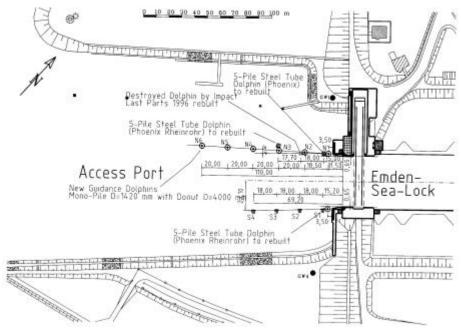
General Layout of Emden Sea-lock access port with new fender-line
